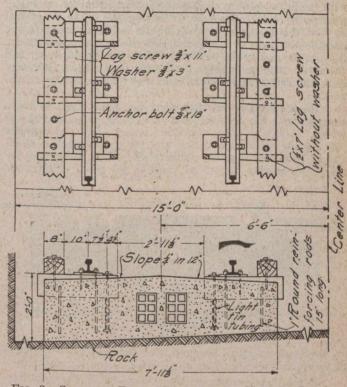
CONCRETE TRACK CONSTRUCTION USED IN BERGEN HILL TUNNEL OF D.L. & W. RY.
